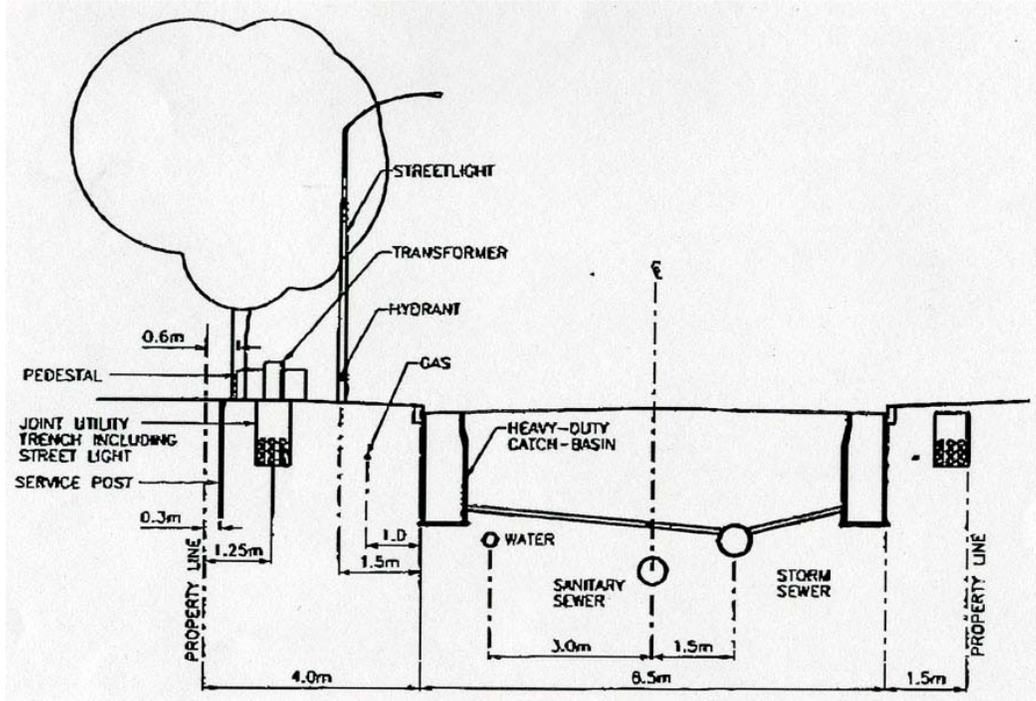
The 8.5 Metre Pavement of a 16.5 Metre Right-of-Way
